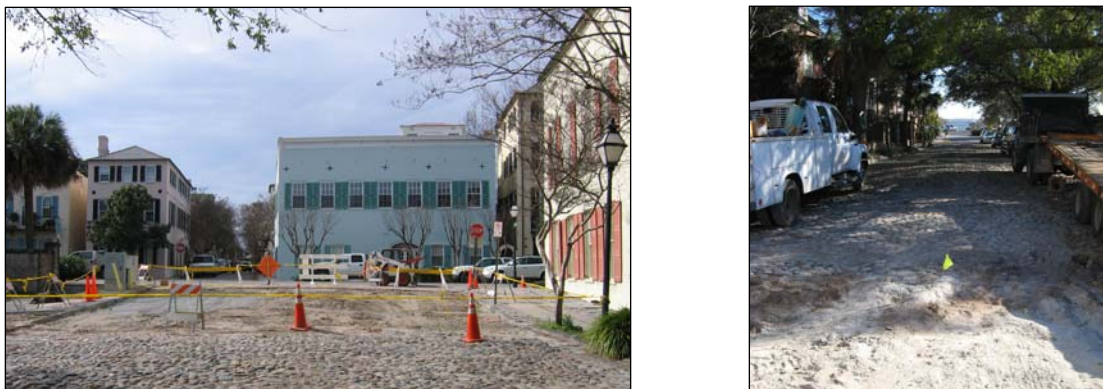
Views of the SAW site in 2008; facing west toward Tradd Street, facing east toward the Cooper River.
